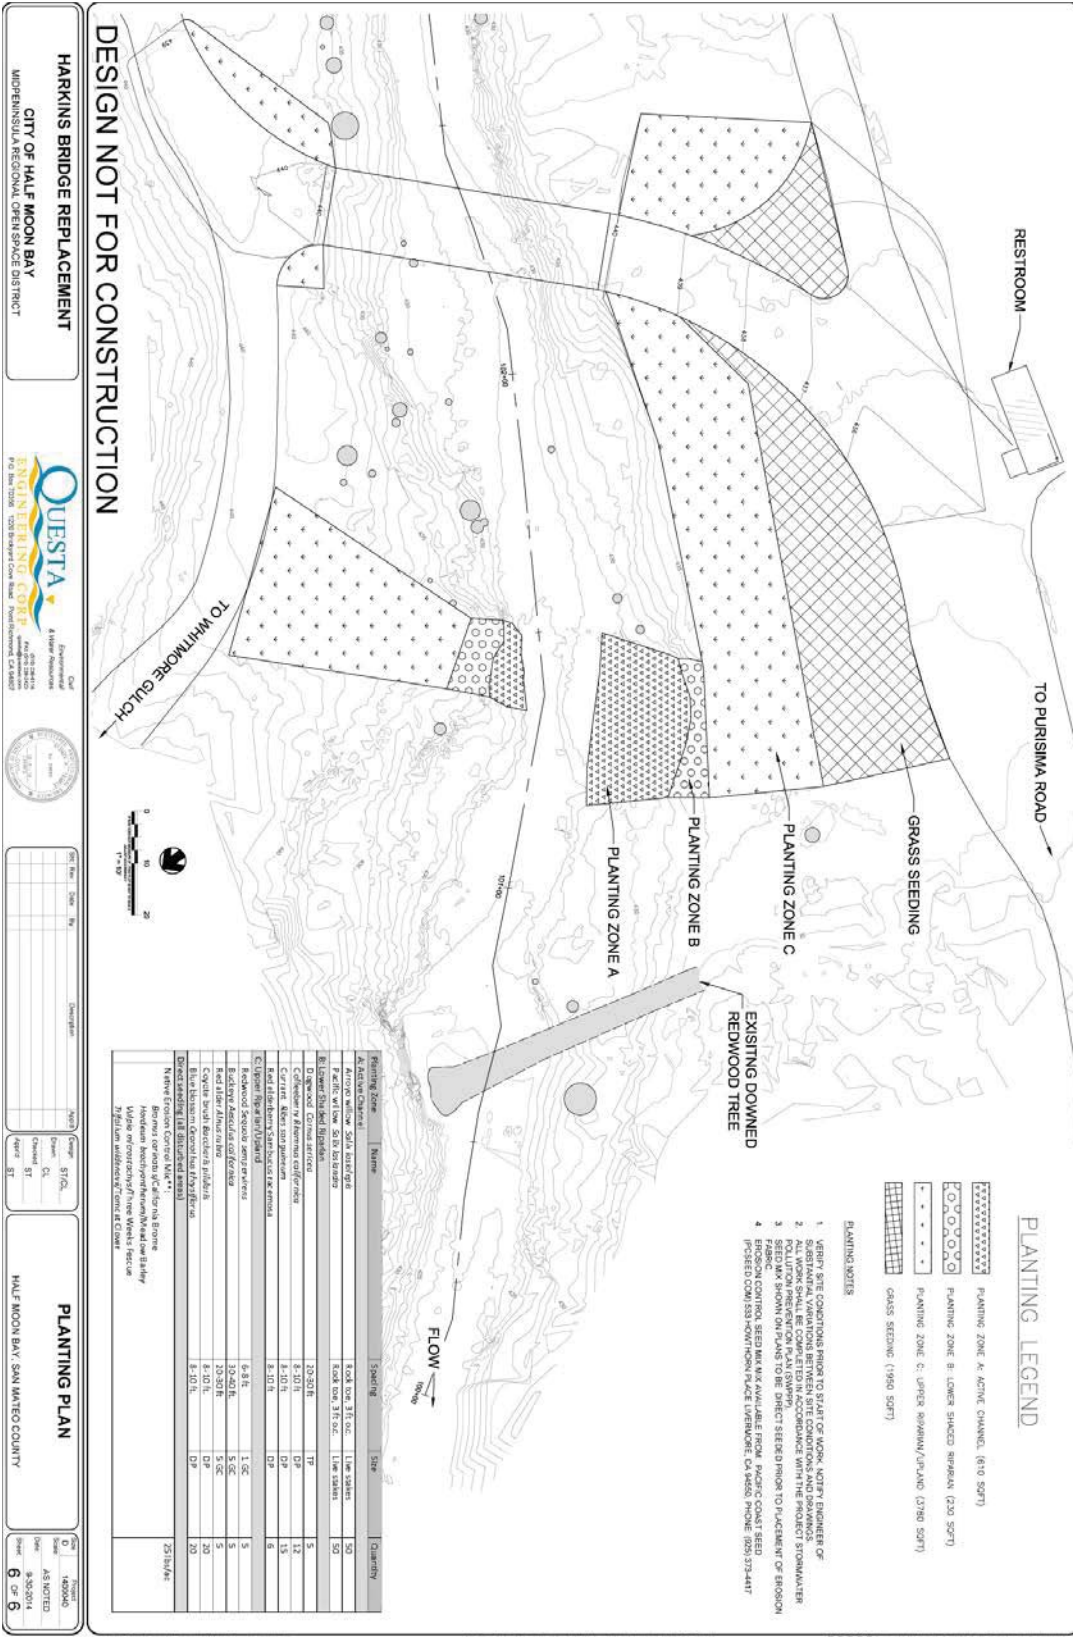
Proposed Restoration Area Where Existing Bridge Removed
